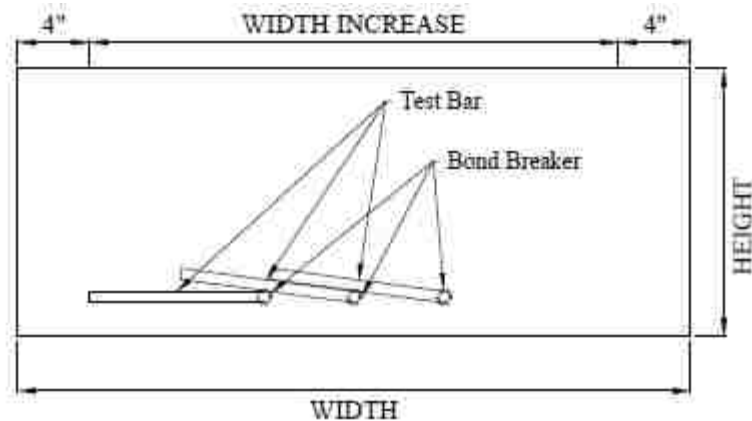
90 degree hook, 0 degree (nominal) tilt, 0.5 A spacing, multiple bar specimen
